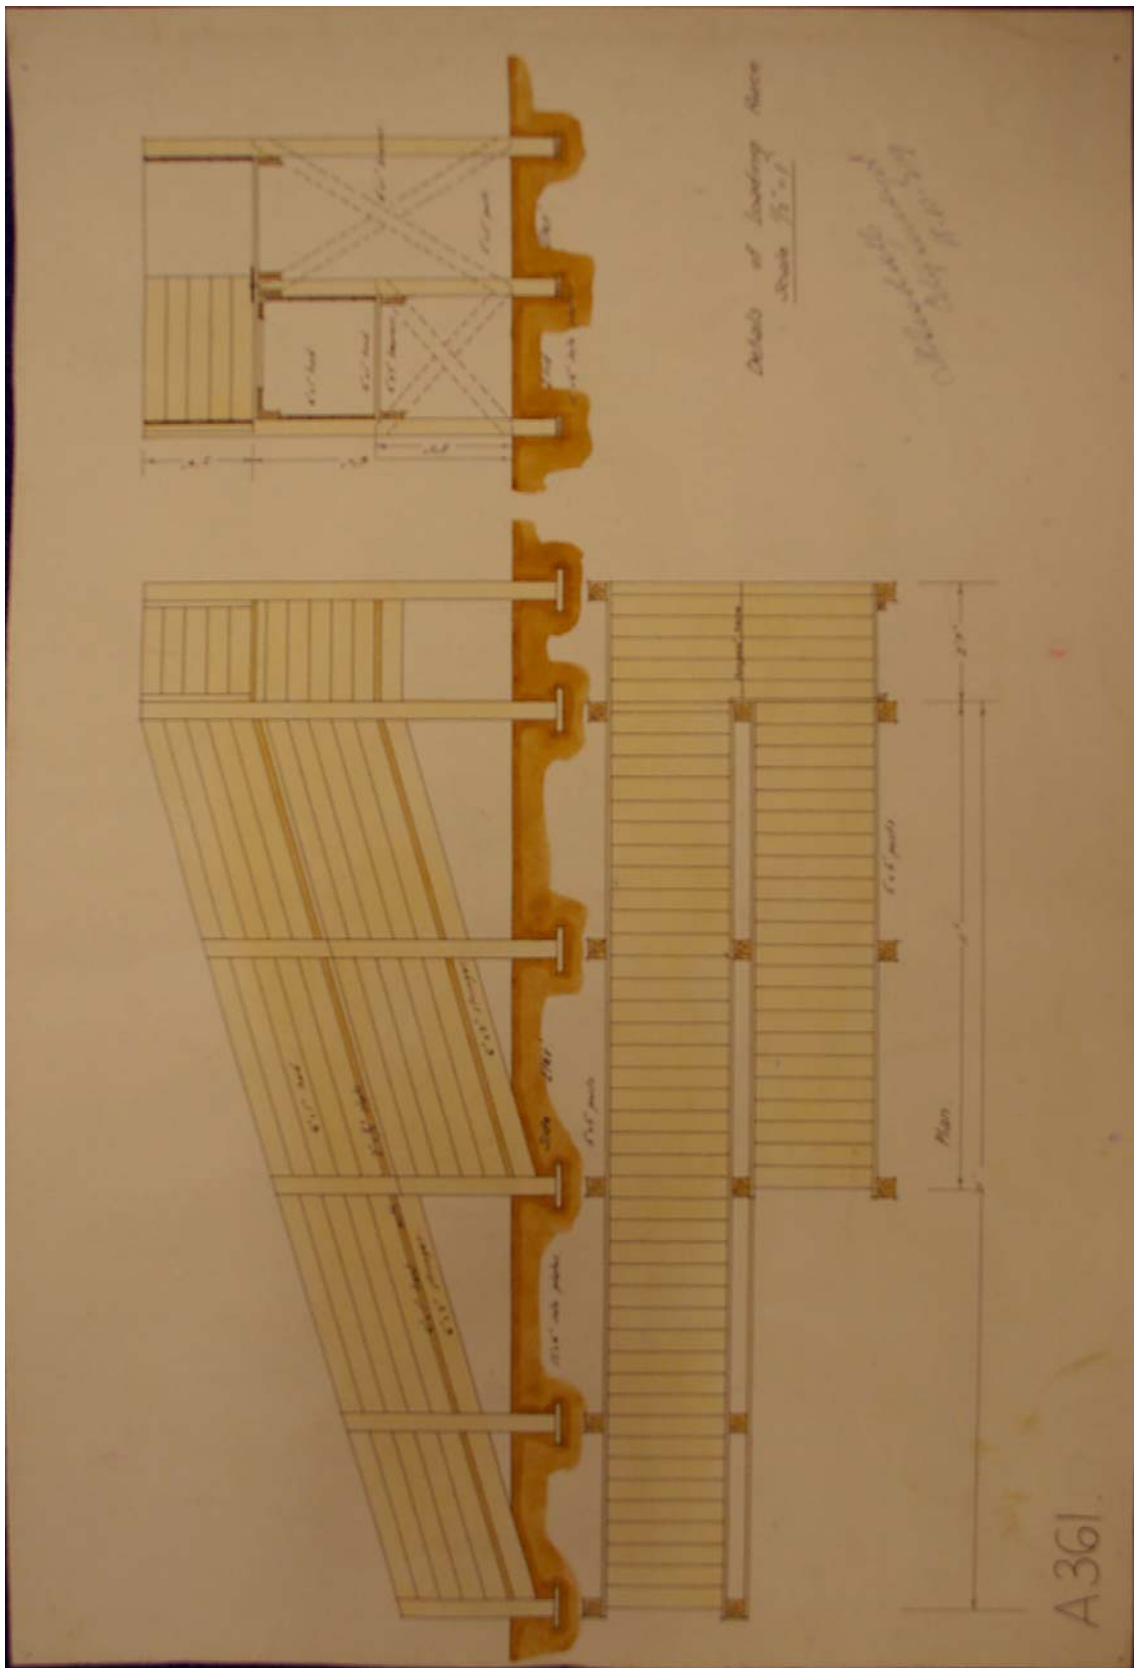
Plan showing details of Loading Race, 18 October 1929 (location not known). Source: Geelong Council Plans collection, A361, Geelong Heritage Centre.
